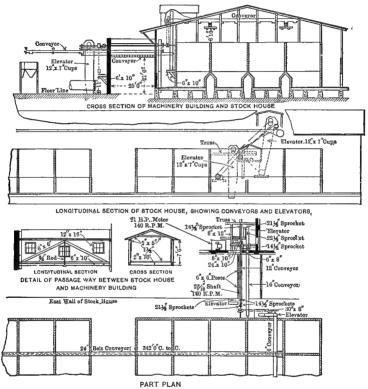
Plan and sections of stock-house, Hudson Portland Cement Co., showing conveying machinery. (Engineering News.)
